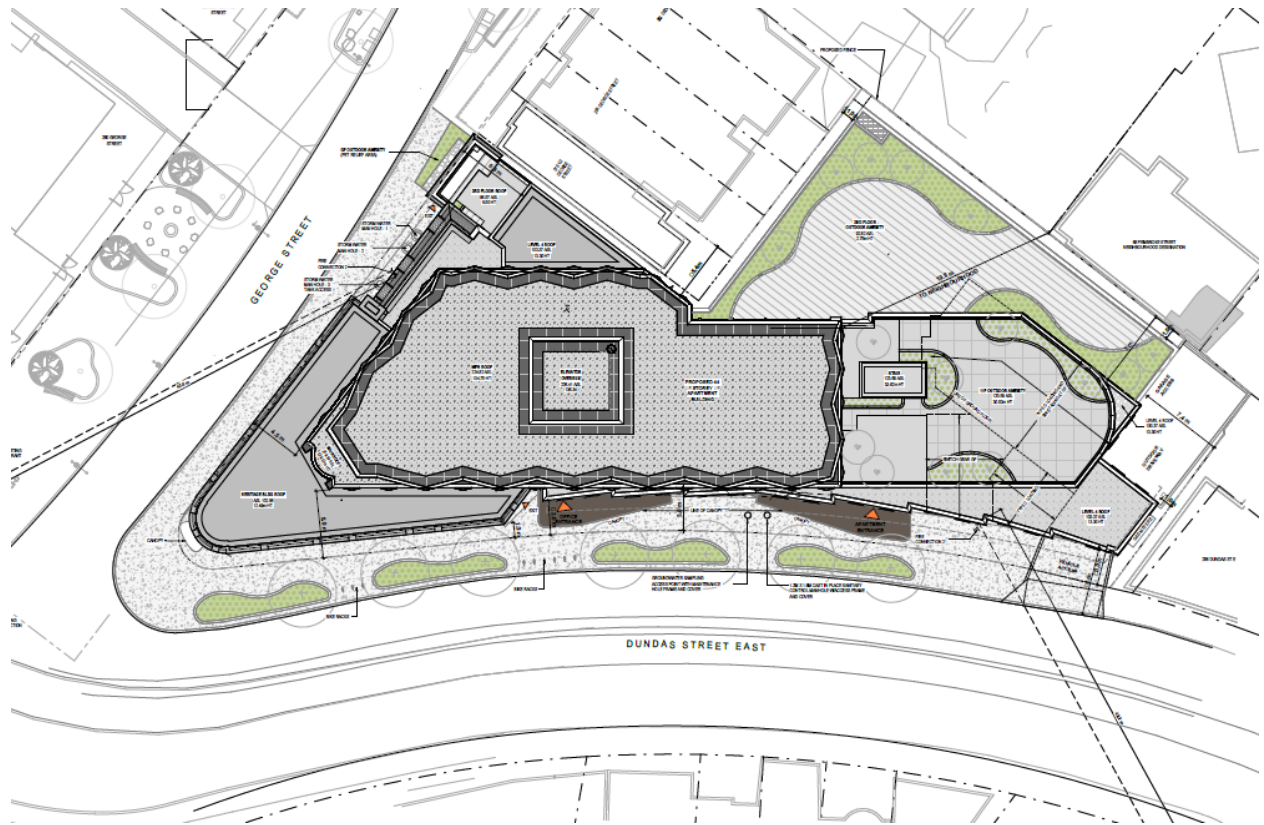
Site Plan for 212 Dundas Street East included for illustration purposes (Rafael & Bigauskas Architects Inc., February 23, 2026).
